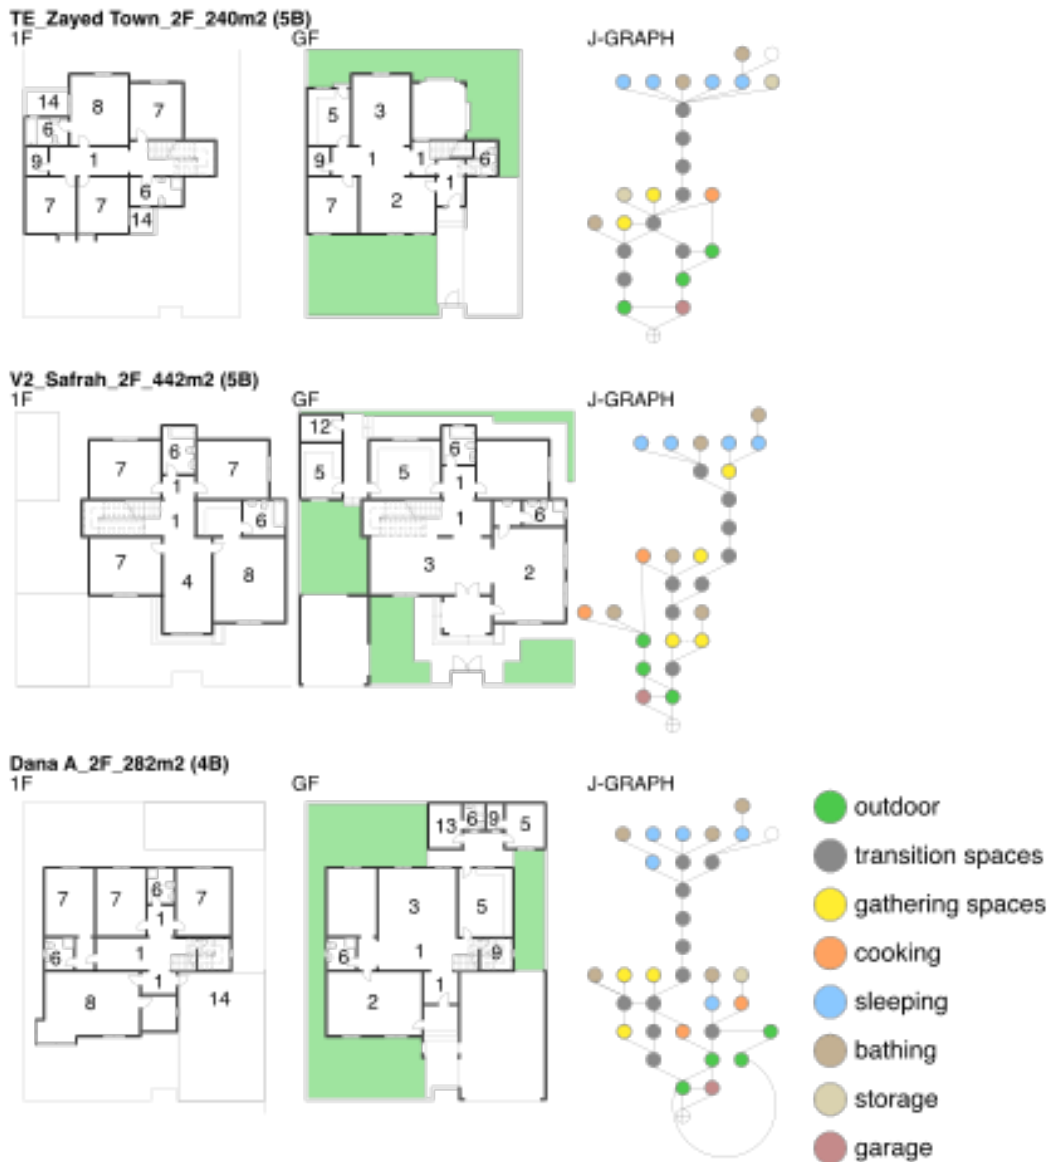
Plans and J-Graphs of MOH subsidised houses — singular cases. Source: <http://www.housing.gov.bh/en> 1.entrance hall; 2.majlis; 3.living room; 4.family room; 5.kitchen; 6.toilet; 7.bedroom; 8.master bedroom; 9.storage; 10.garage; 11.outdoor kitchen; 12.laundry; 13.maid room. 14.veranda/terrace
